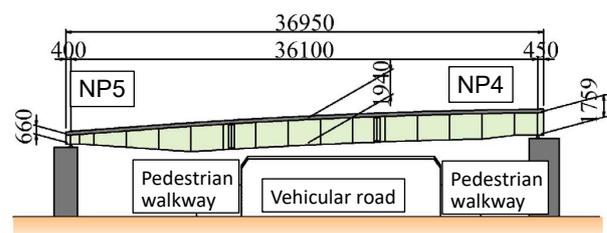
Side view of the Shinanobashi Rampway Bridge
